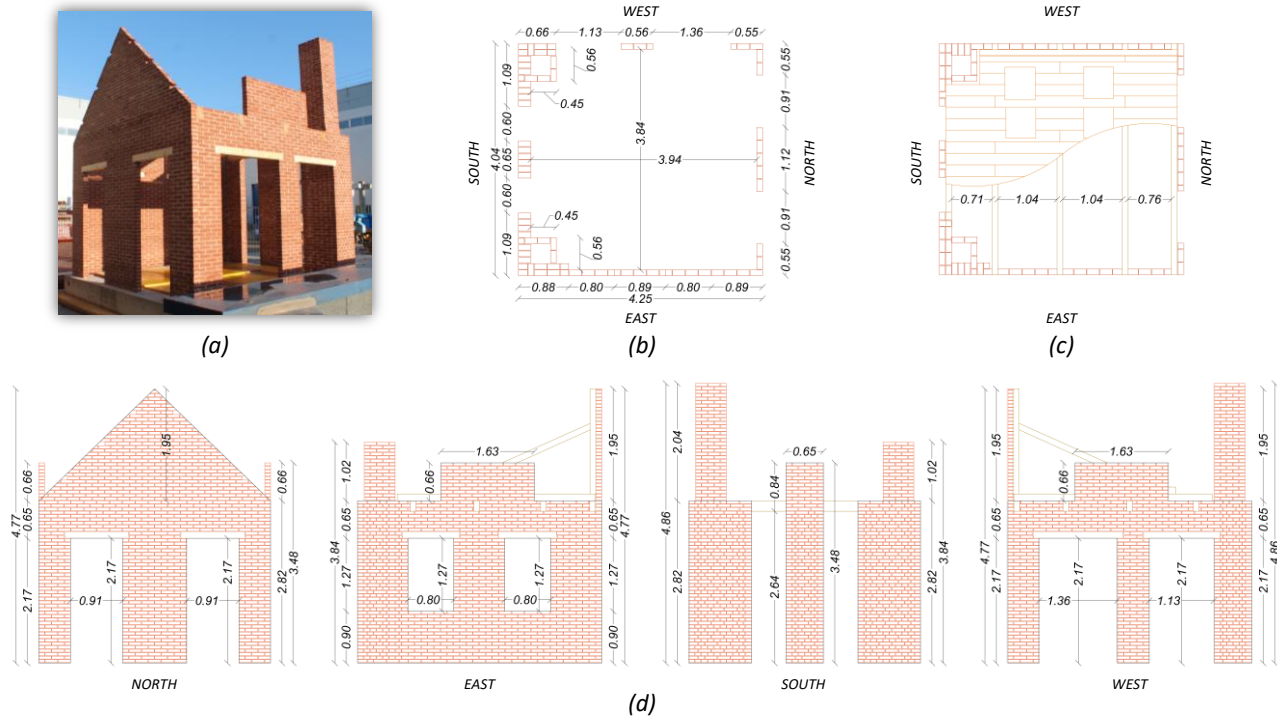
Full-scale building specimens: (a) North-West view; (b) ground-floor plan; (c) floor framing plan; (d) elevation views (units of m).
